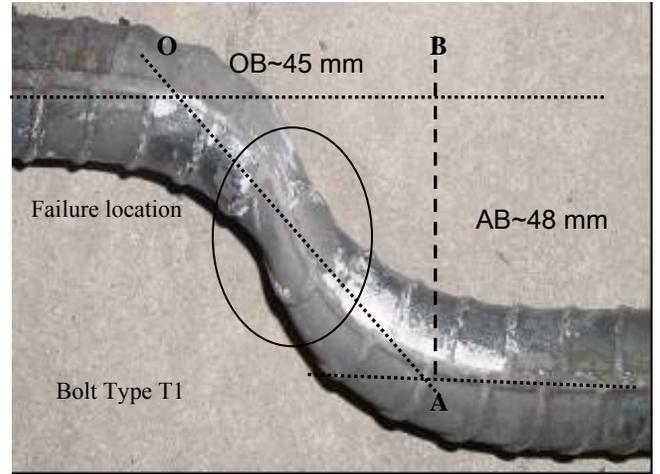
Excessive bolt necking in concrete 100 MPa in 80 kN pretension load, Bolt Type T1
